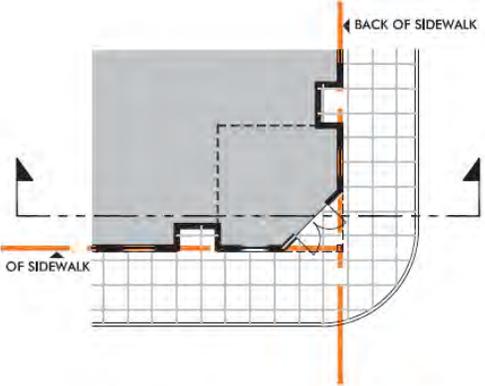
New Section 21.62.020.M Old Town Historic Core Overlay
